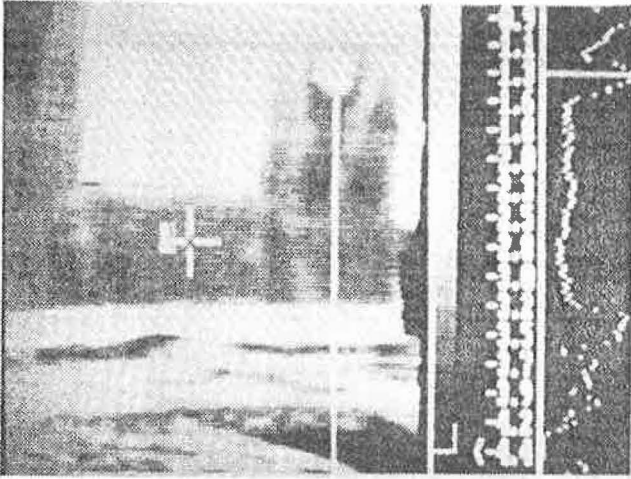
Thermographic picture of the building exterior indicating heat losses through the concrete base of the external wall and also showing a leaky window.
